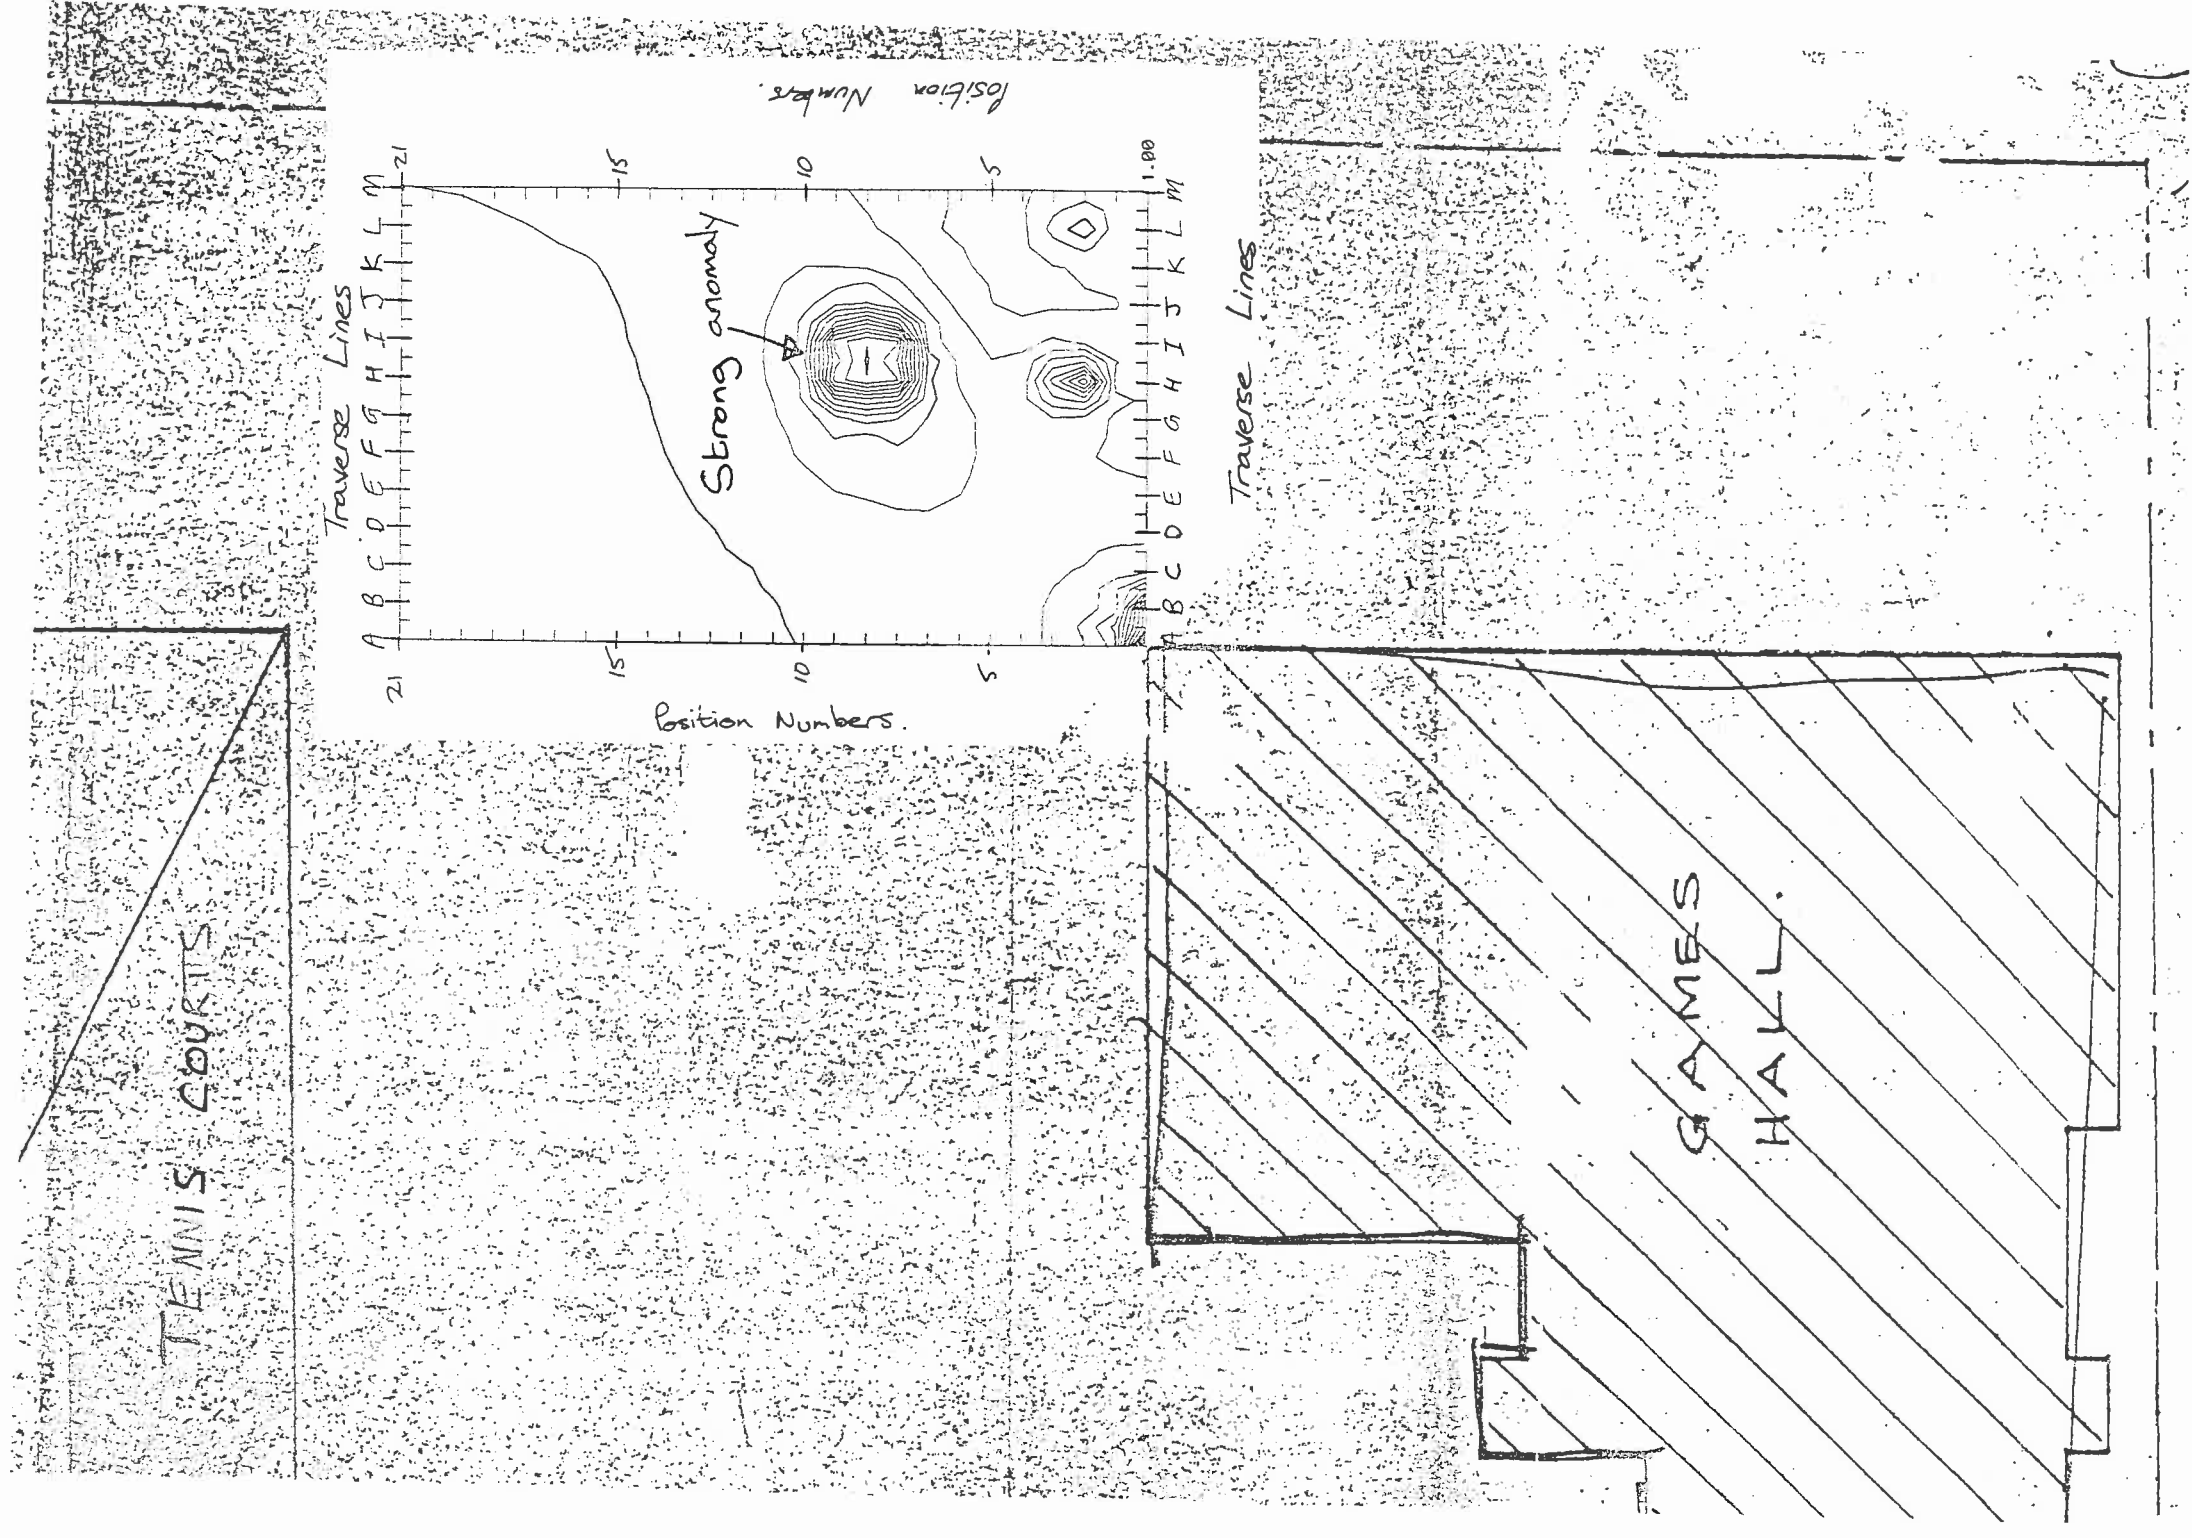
d: Site plan indicating location of trial pit + concrete slab.
